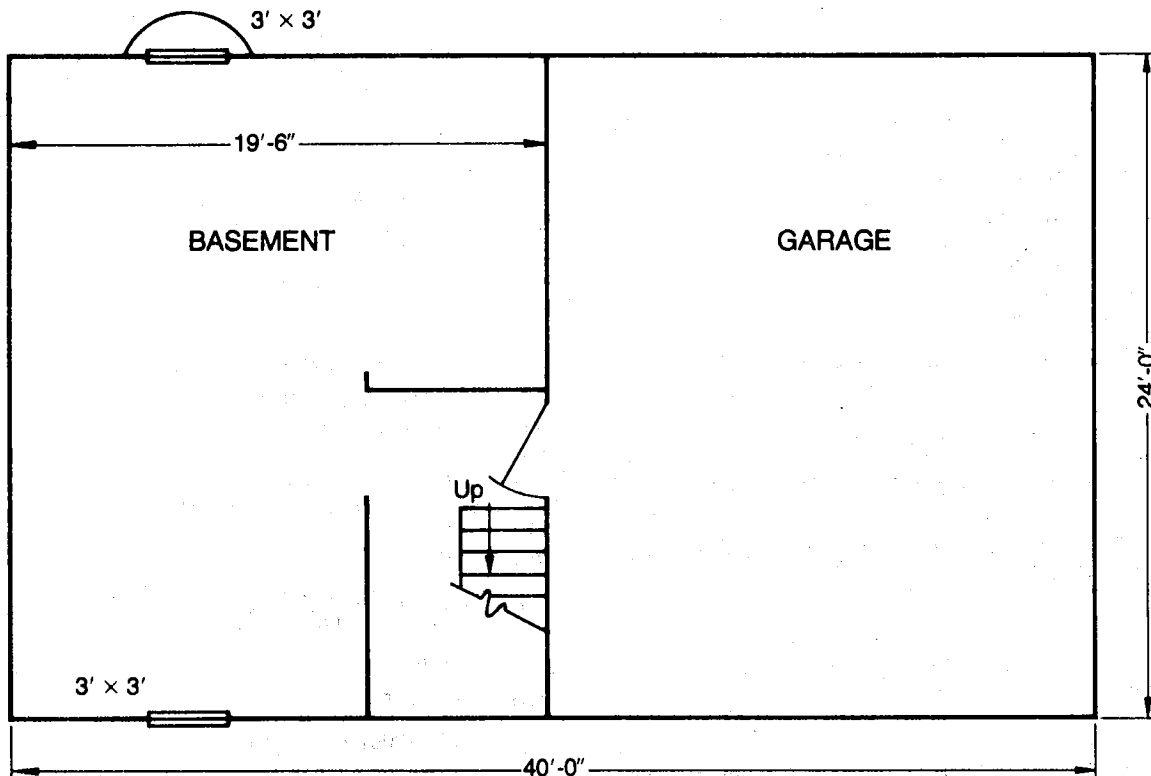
Ground Floor Plan for Residence of Example 7.4.
